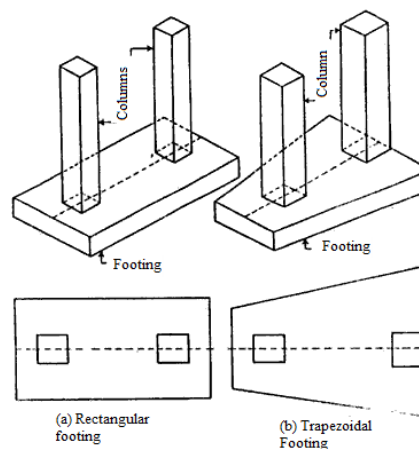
Schematic view of (a) rectangular footing; (b) trapezoidal footing [37]
